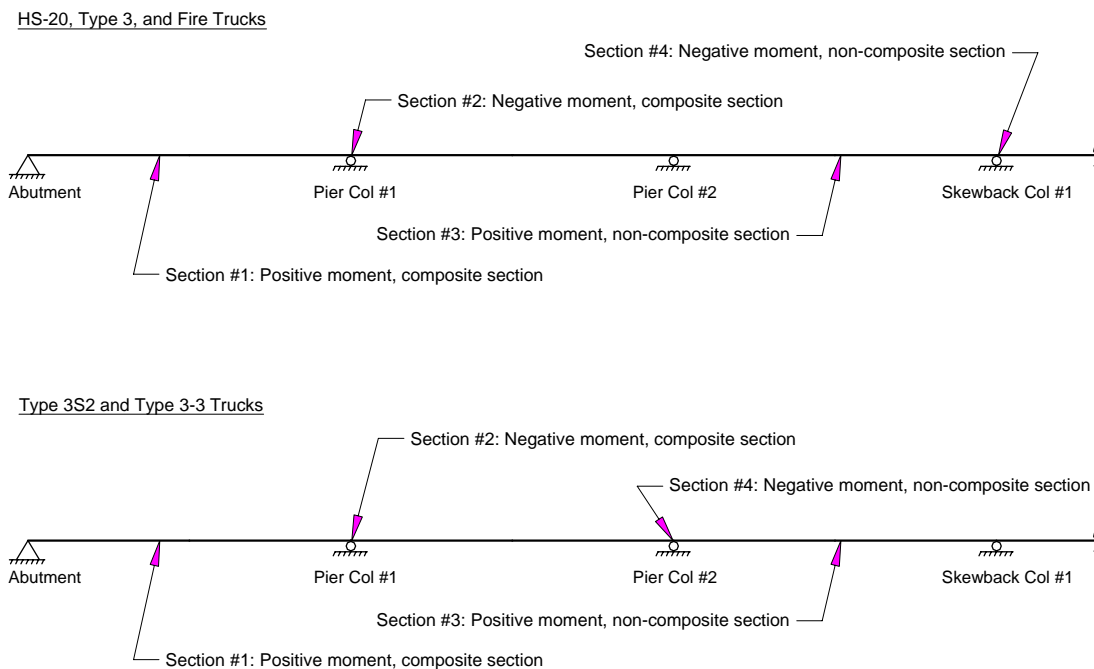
BEAM rating model of spandrel beam (including critical sections).
